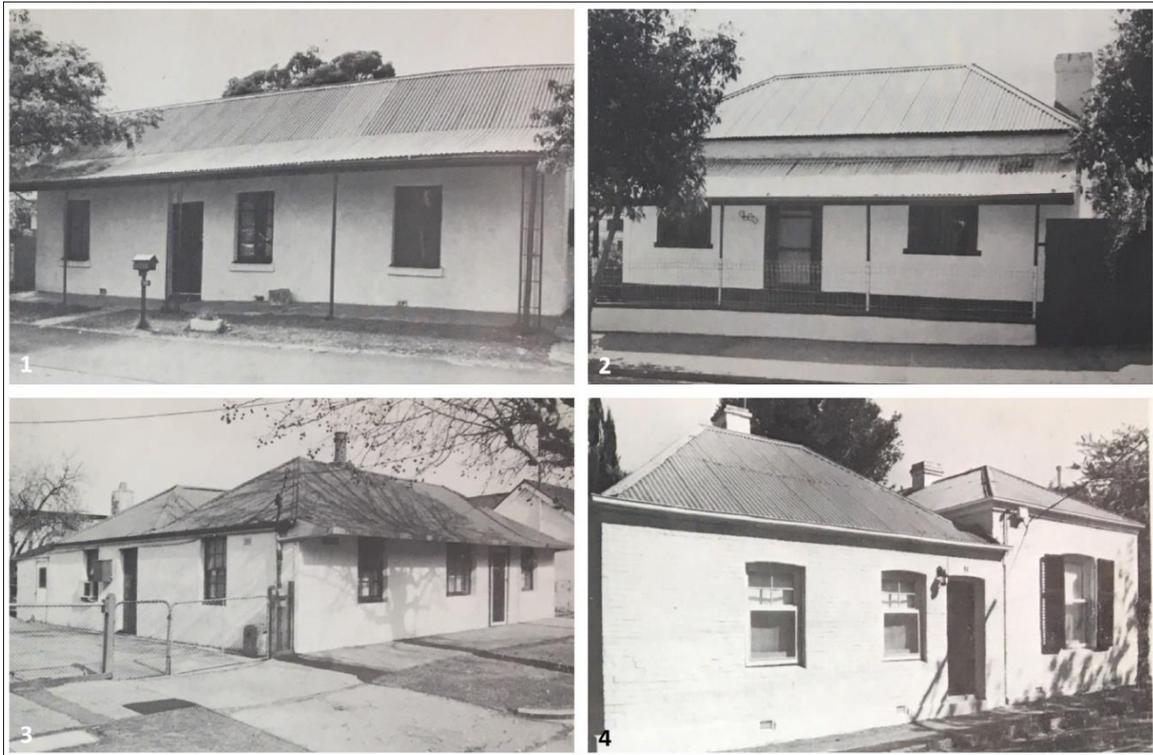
Examples of Adelaide early colonial cottages: 1) c.1840, pisé construction, gable roof, verandah added later; 2) 1850, hipped roof, verandah added later; 3) c.1850, hipped roof, two-room extension with identical hipped roof at rear, lean-to addition with skillion roof; 4) c.1850, brick construction, hipped roof, no eaves. Source: Persse and Rose 1981:2–5.
